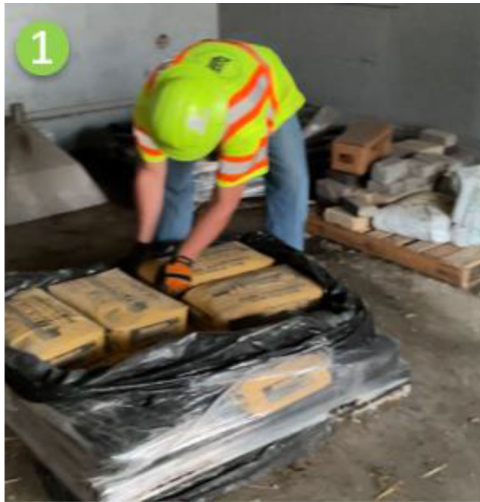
Lifting bags of dry concrete mix alternative—step one.
